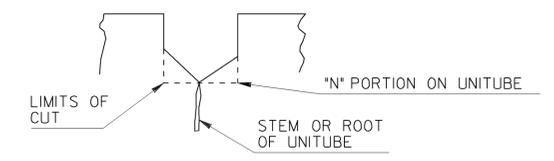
DETAILS FOR PATCHING PORTLAND CEMENT CONCRETE PAVEMENT
